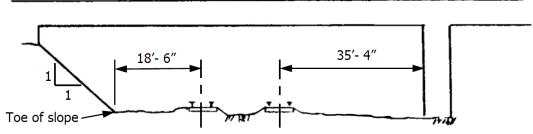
Bridge elevation view indicating horizontal offset for two railroad tracks below the bridge.
